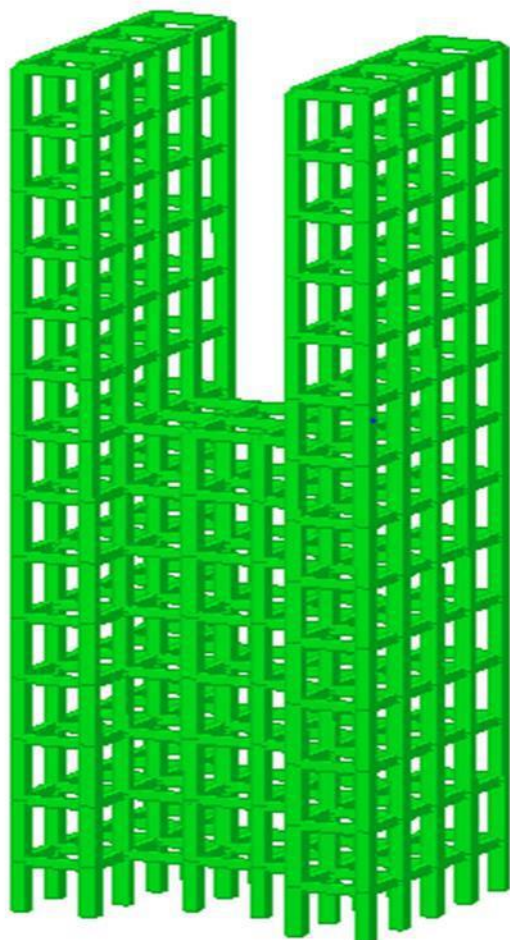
Isometric view of connected tower having floor twin up to 6th floor.
